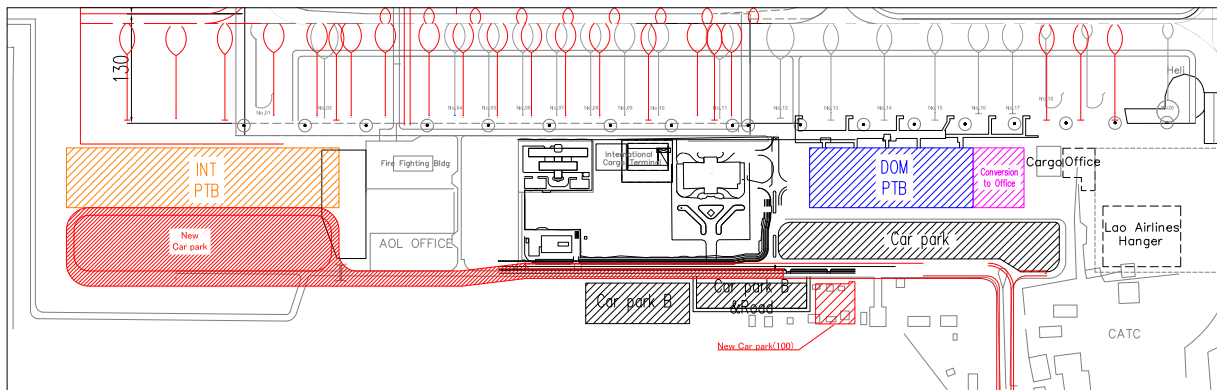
Case-2 Improvement Plan of Terminal Area
